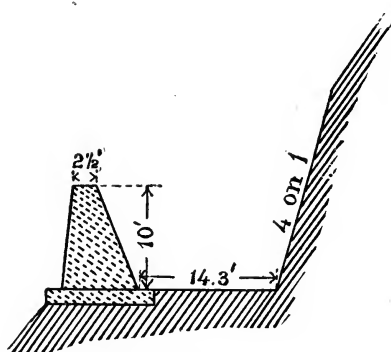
ROCK CROSS-SECTION, BEAR RIVER CANAL.
